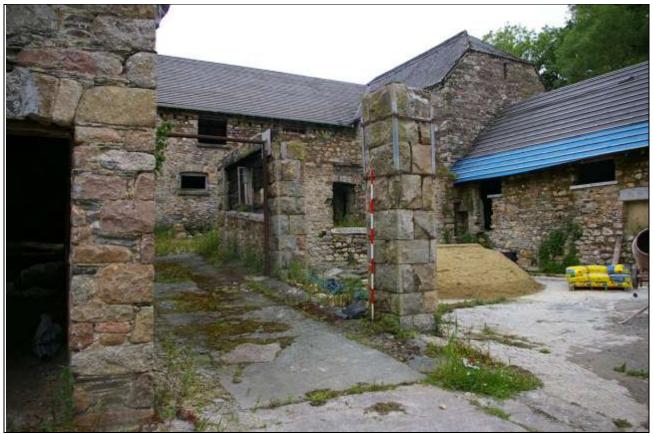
THE WESTERN END OF BARN E, MORE SUBSTANTIAL THAN THE REST, WITH SURVIVING BOARDING AND ONE STONE WALL; FROM THE SOUTH-EAST (2M SCALE).
